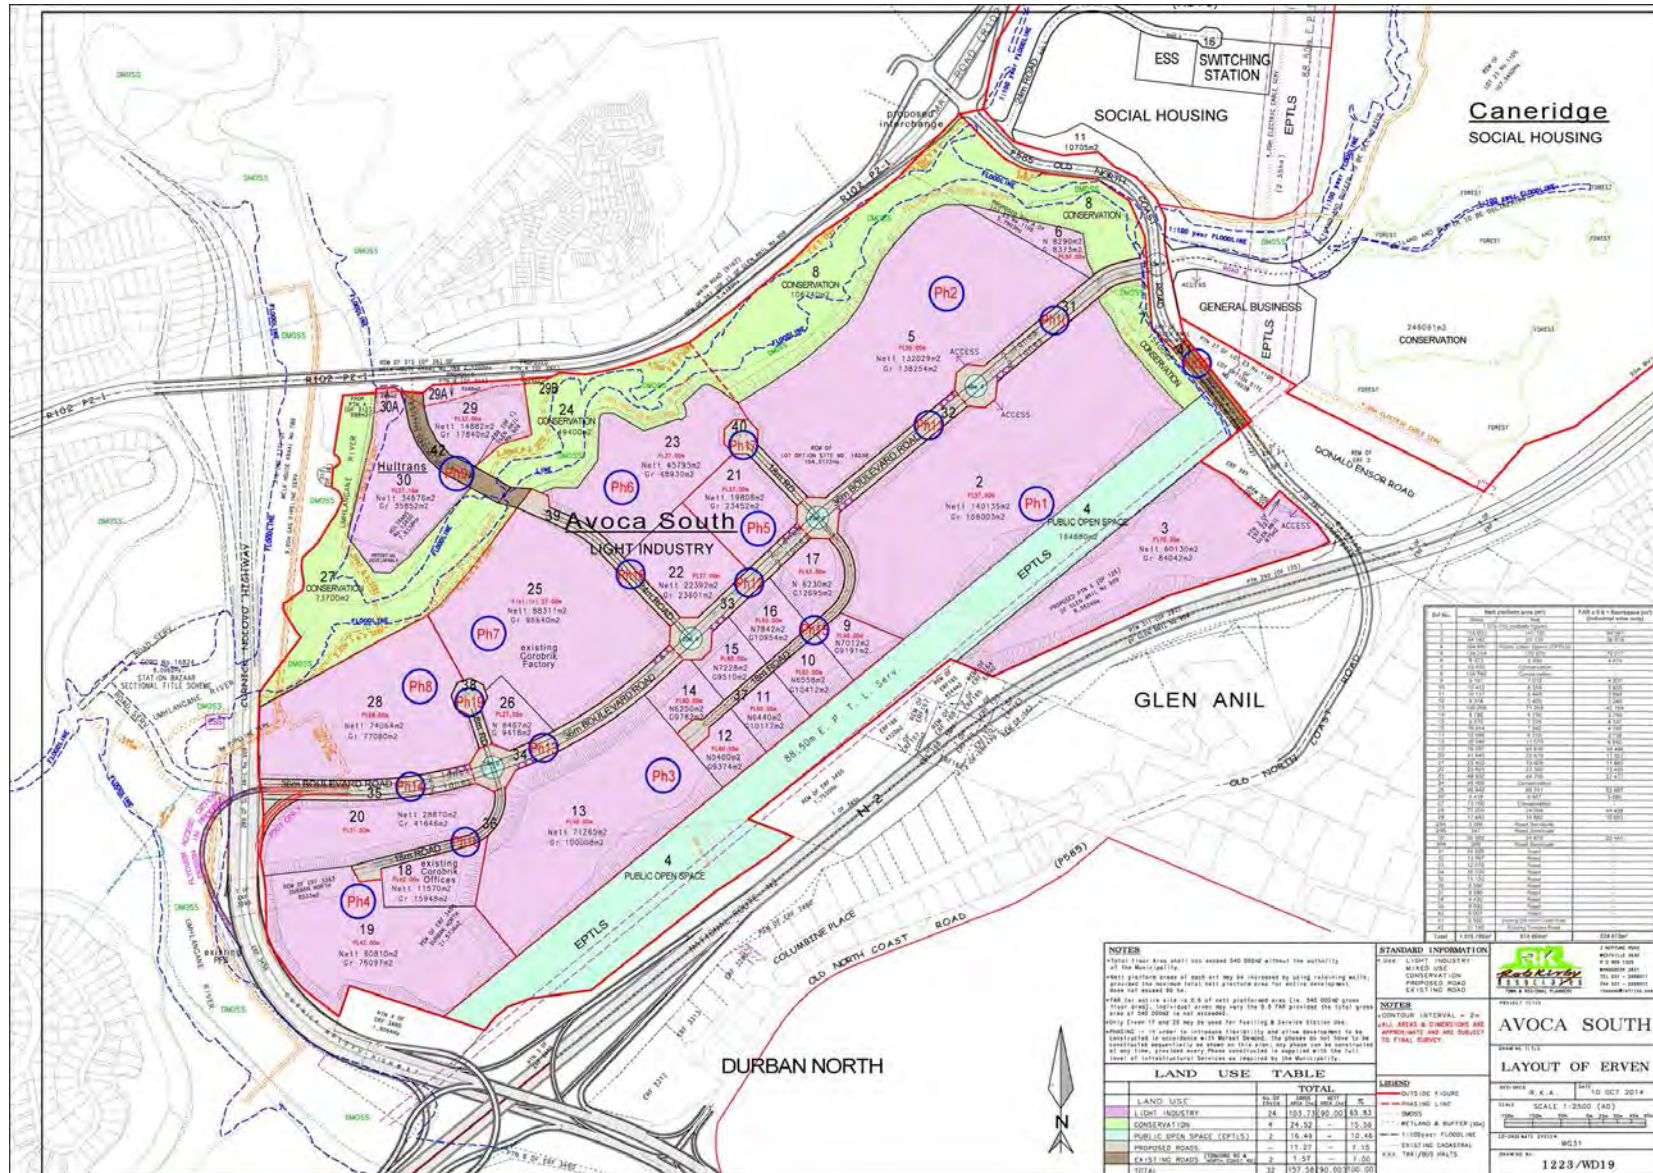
Layout Option 4 (Drawing No. 1223/WD19)
